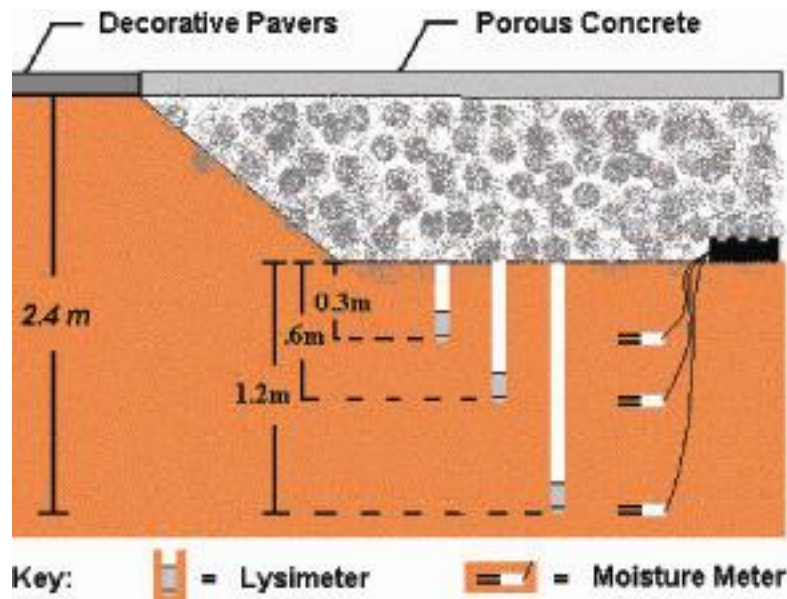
Porous Concrete – Cross section of instrumentation (Kwiatkowski 2003)
